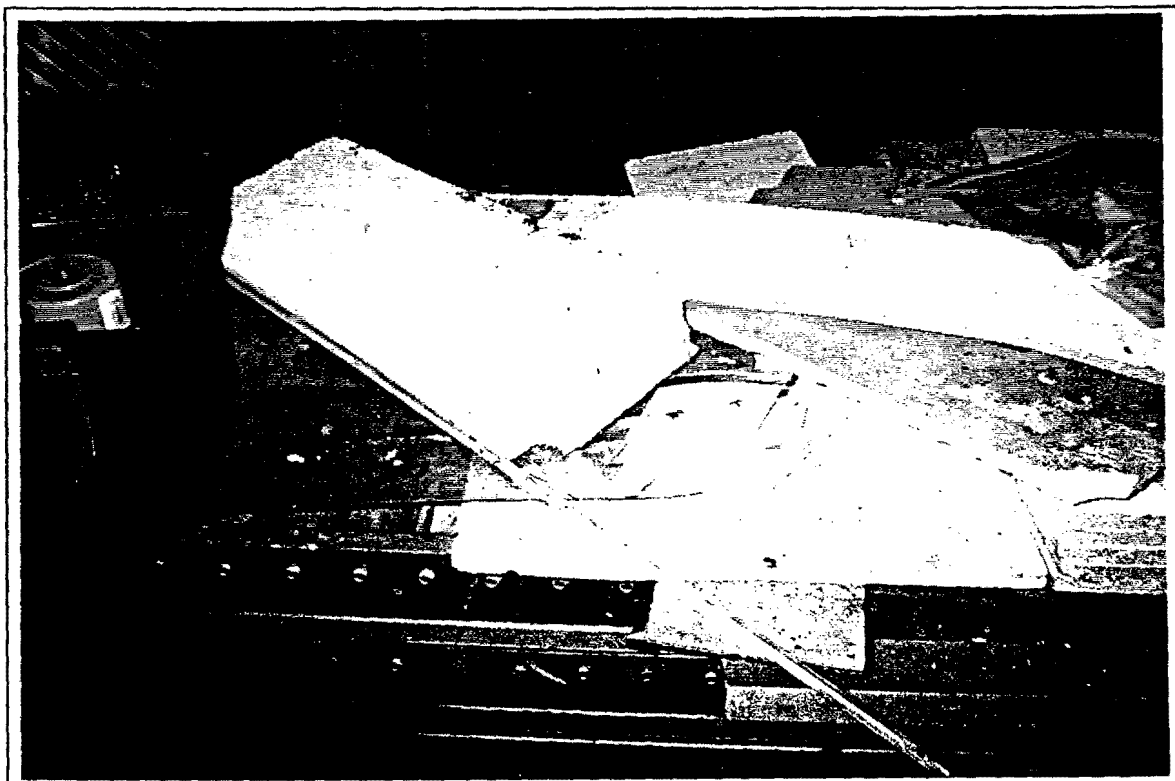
Building 30A - Pre-cut non-asbestos ceiling tile panels found in box within building interior (Sample No. 1-040).
